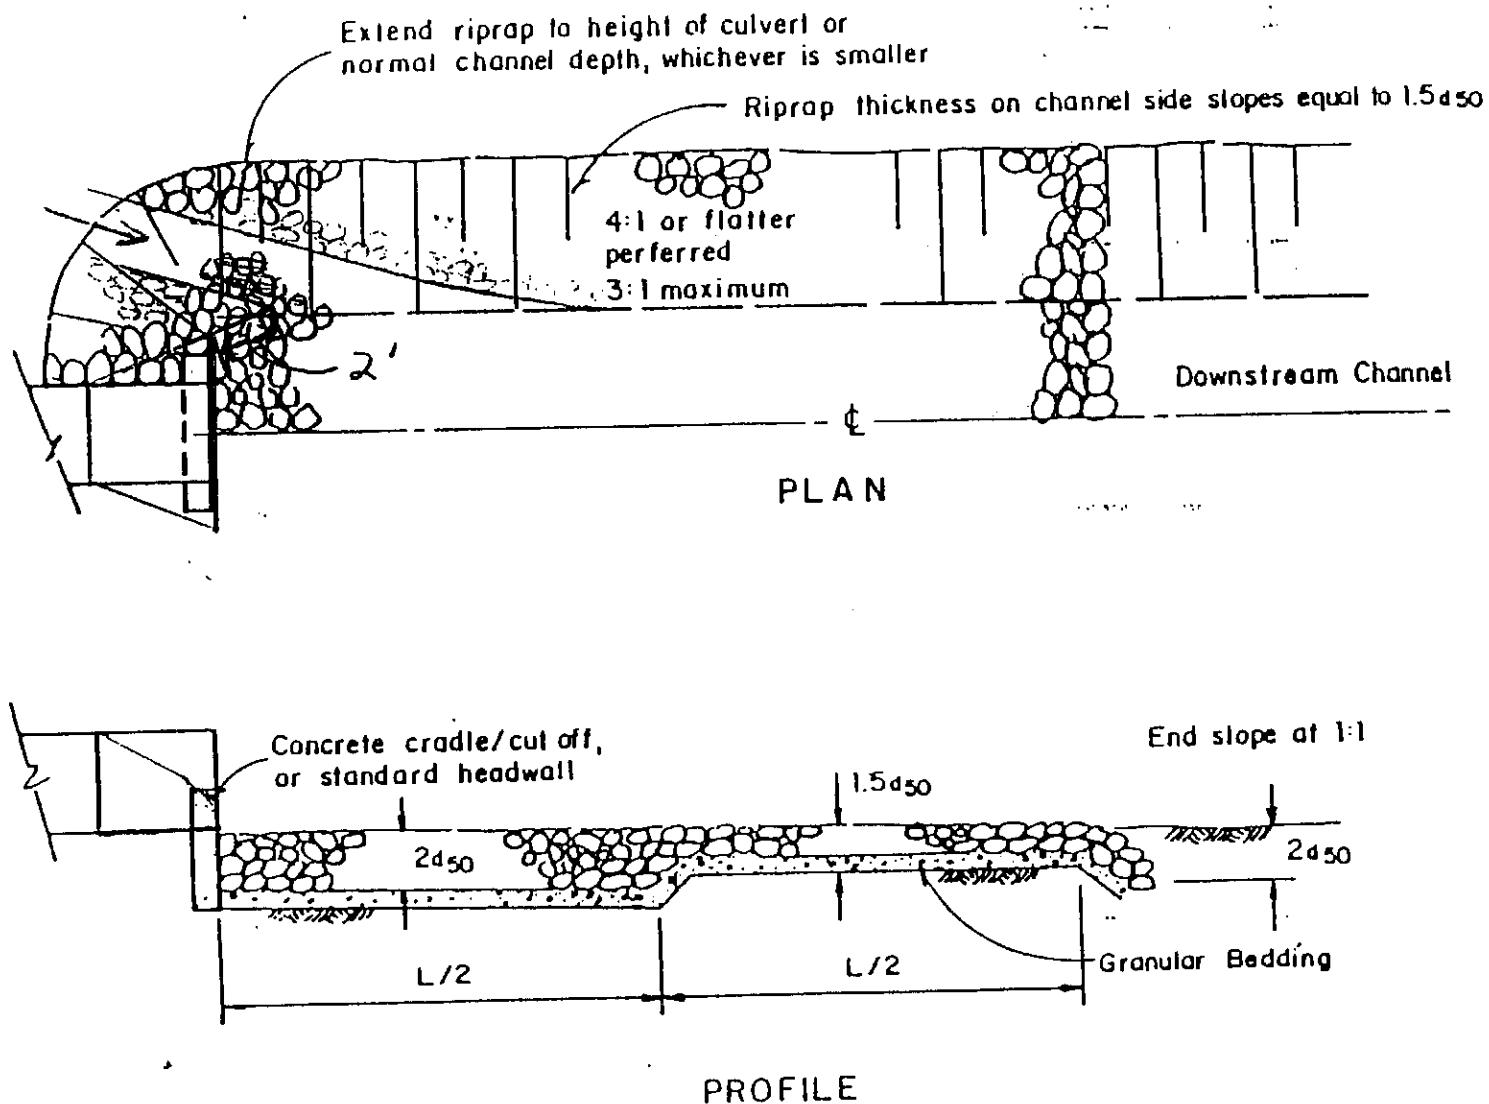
CONDUIT OUTLET EROSION PROTECTION
